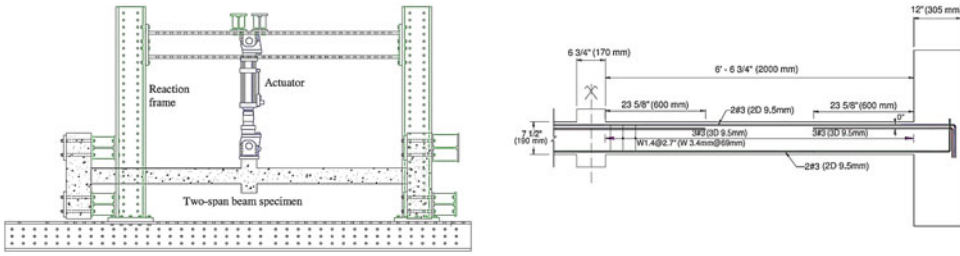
Specimen setup and reinforcement detail (Sasani, Werner, and Kazemi 2011).
